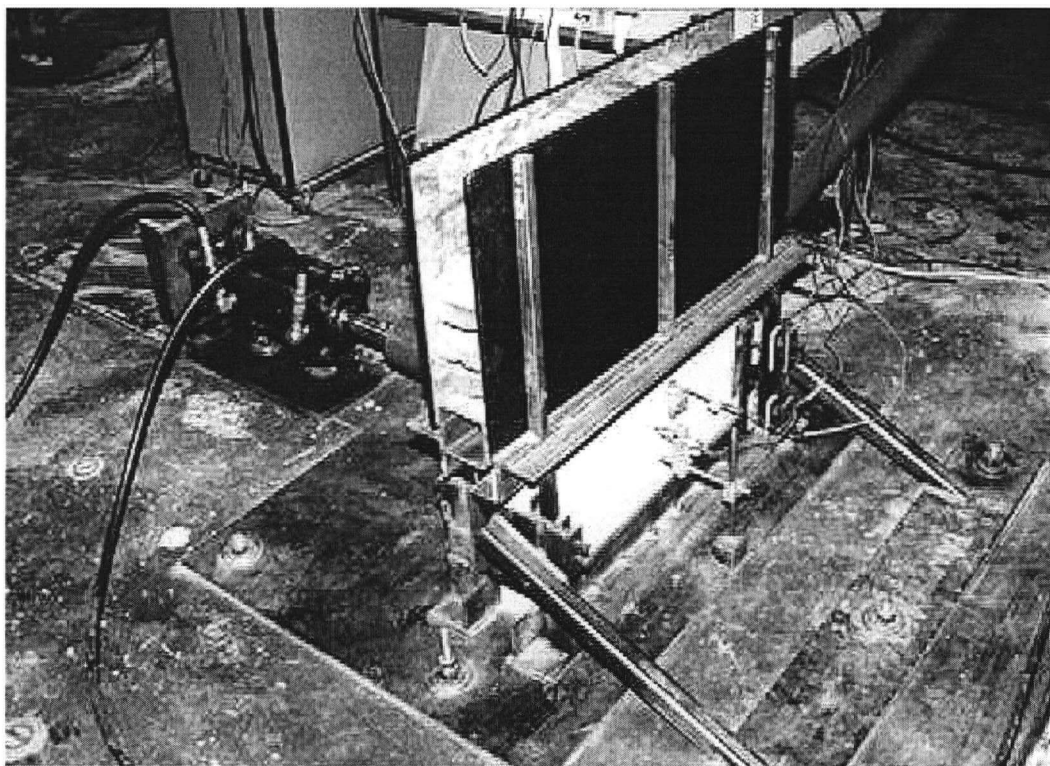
Photograph of a specimen with applied surcharge load.
